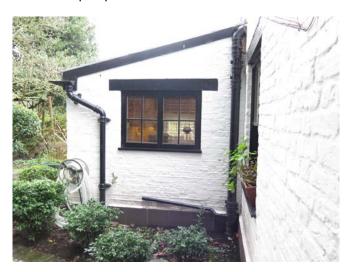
Existing kitchen north elevation white painted brick and painted timber with existing window to be echoed in new winter garden room north elevation wall.
